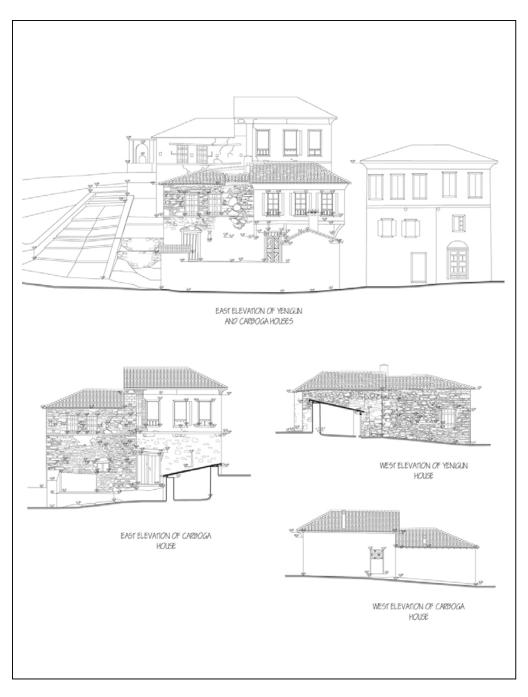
East and West elevations of Yenigün and Çarboğa Houses
